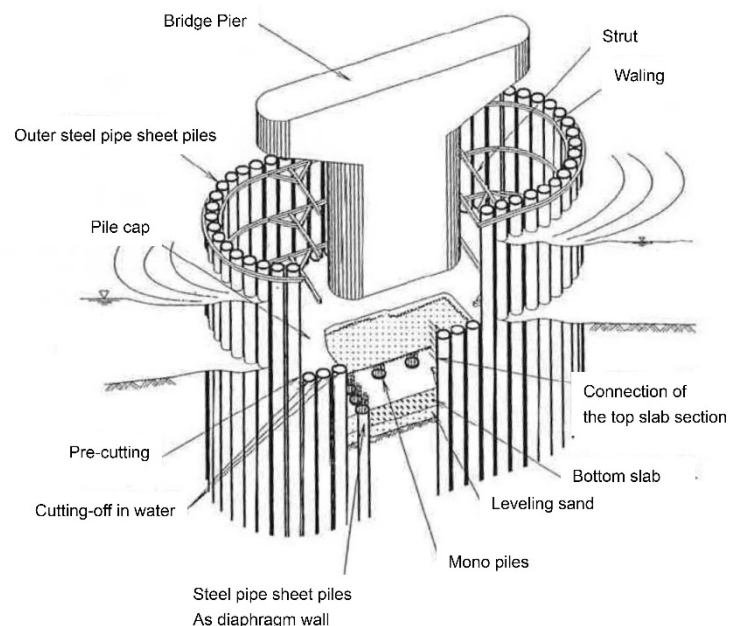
Schematic view of steel pipe sheet pile foundation that is simultaneously used as temporary cofferdam
